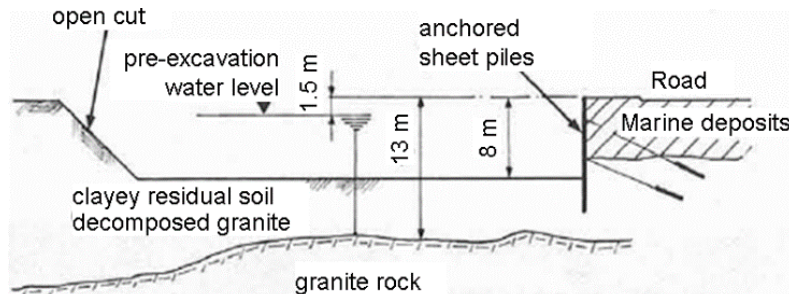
Section through an excavation in decomposed granite (after Davies 1984)
